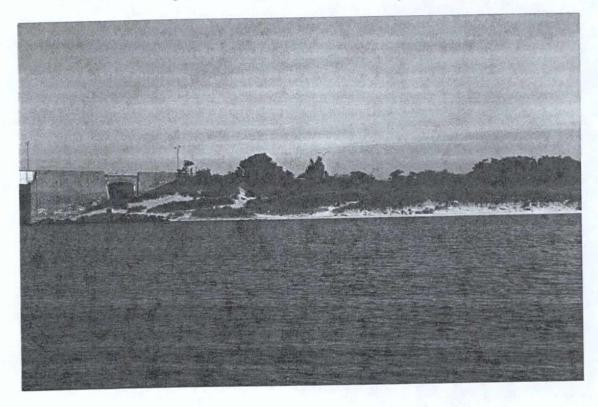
Gerritsen Inlet bridge, eastern abutment view from inlet toward east. Photo 2: Gerritsen Inlet bridge, eastern abutment view from bay toward north.
